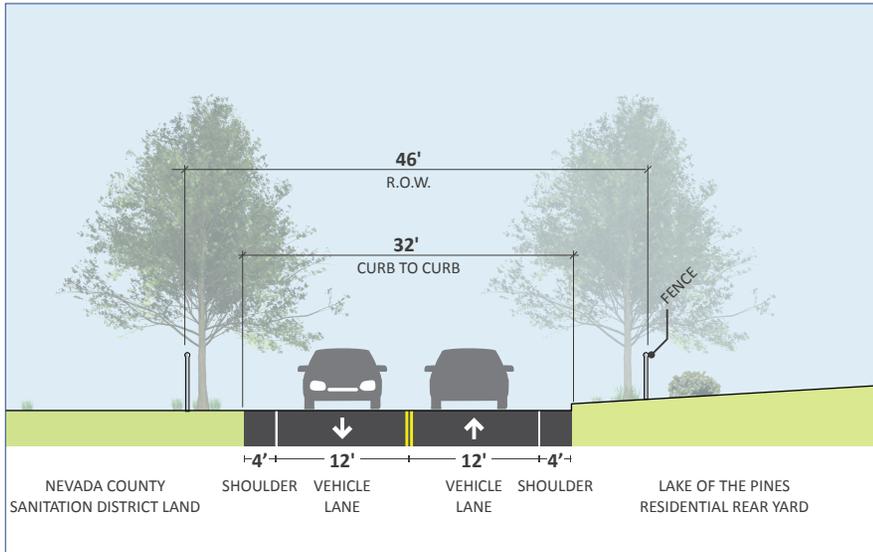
Existing Street Section of South Combie Road at Sanitation District Land (looking north)
